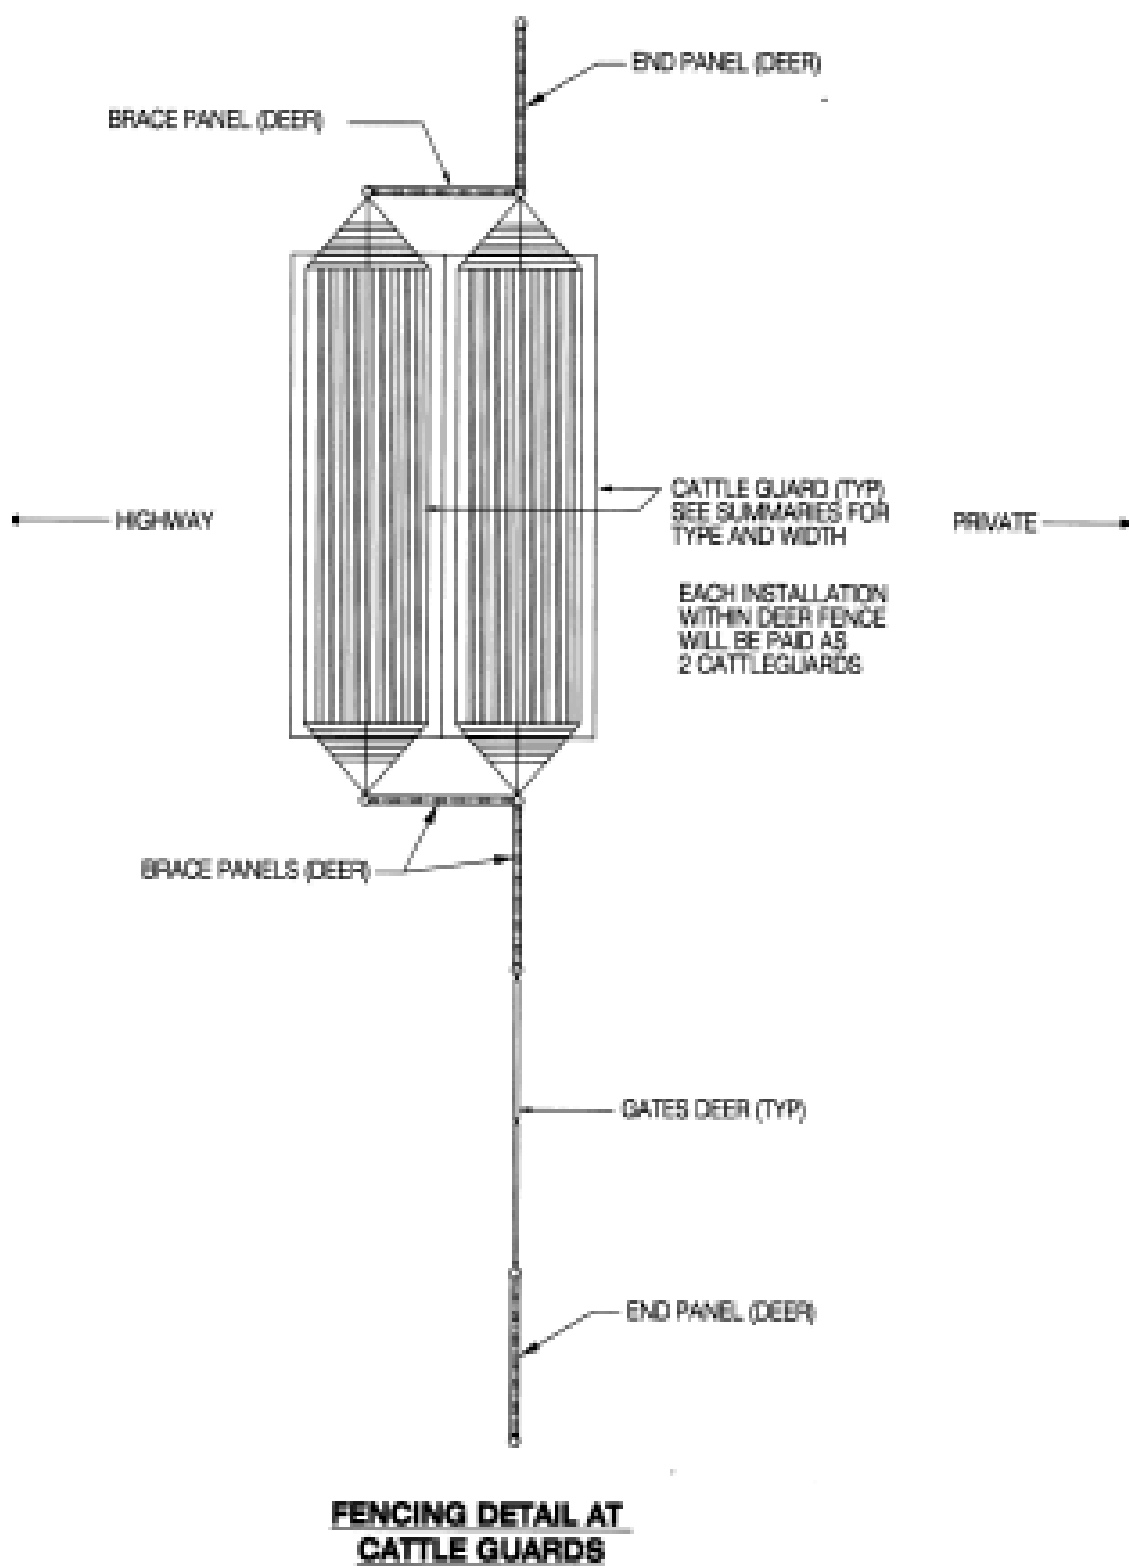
Guard protrudes into roadway side of fence to maintain straighter barrier line (WYDOT, 2009).
